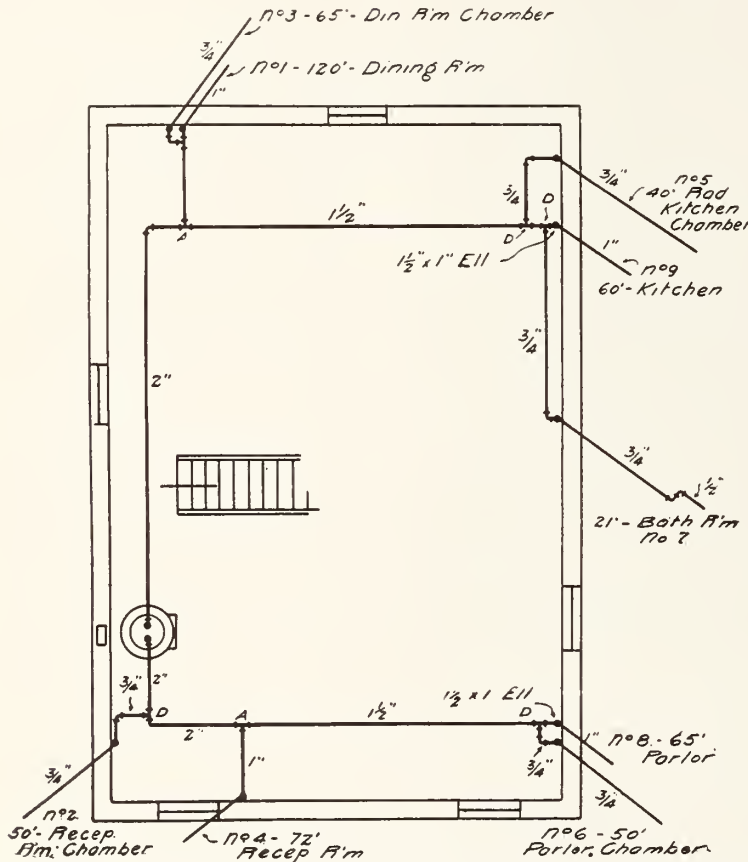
Basement piping plan showing position of the flowing or supply pipes.
